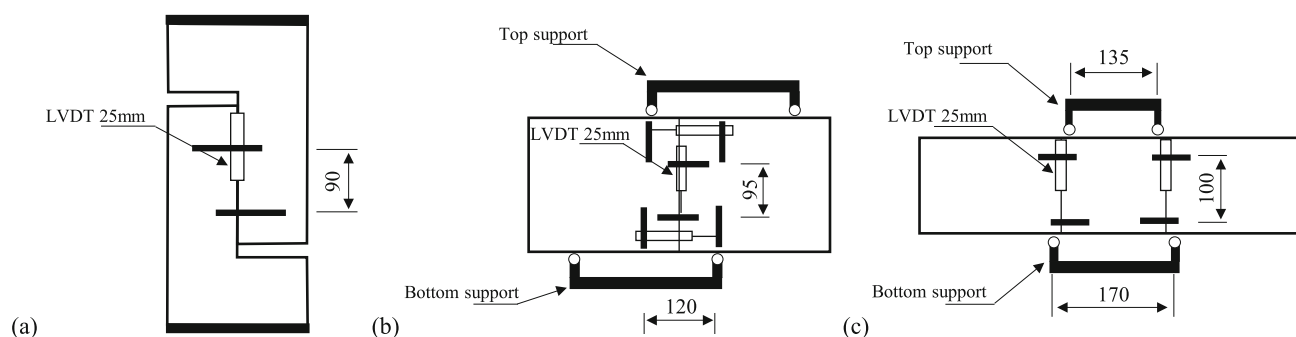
Direct shear tests setup (dimensions in mm): a Z-type, b FIP type standard, c JSCE-SF6
